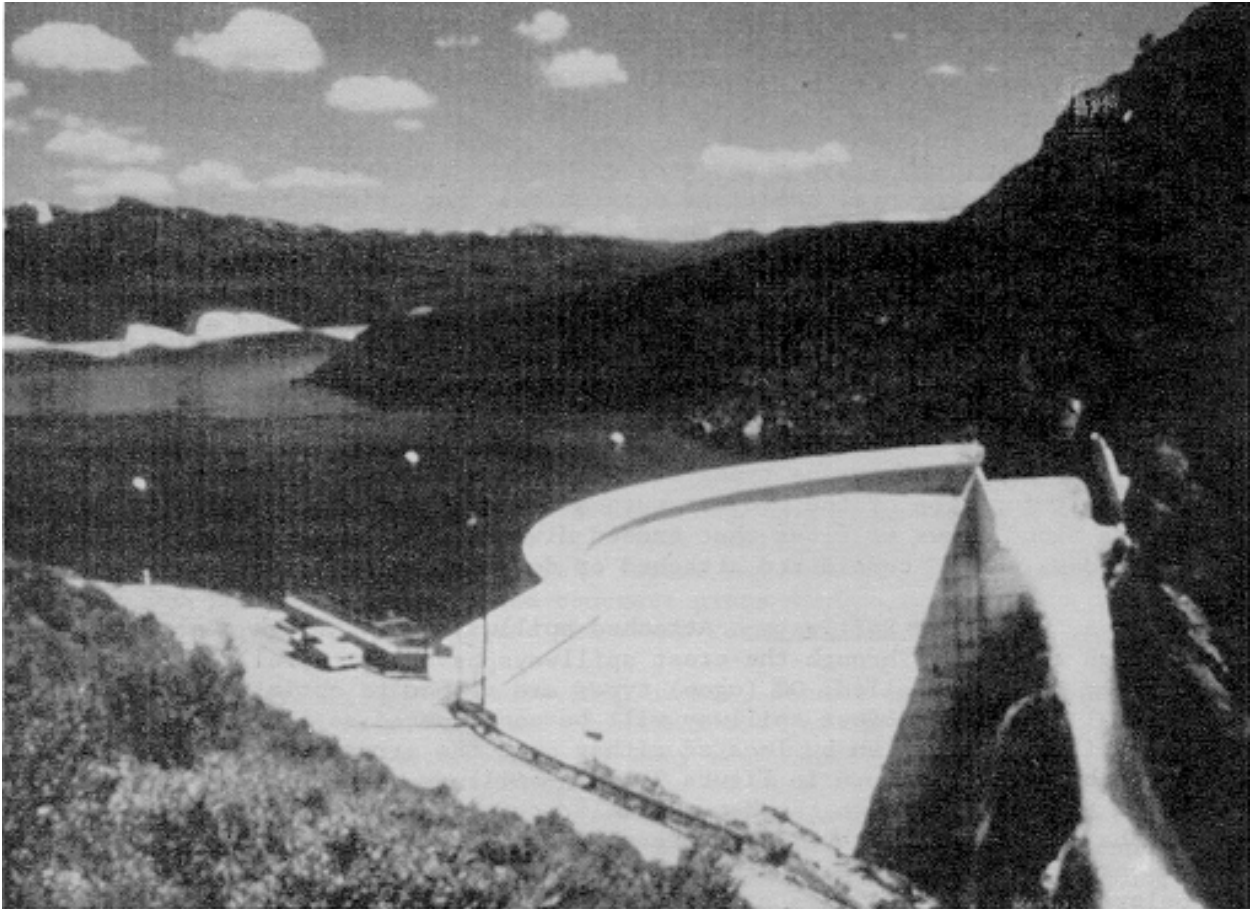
East Canyon Dam with spillway notch near left abutment (USBR)
